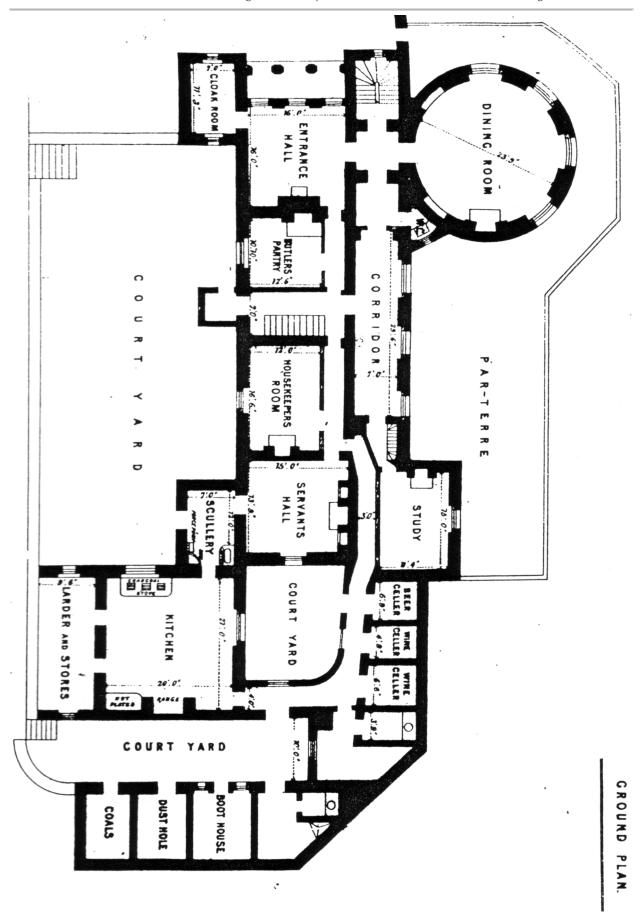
Plan of Pennsylvania Castle in the late 19th century (from a drawing provided by John Stark Crickmay Partnership)
